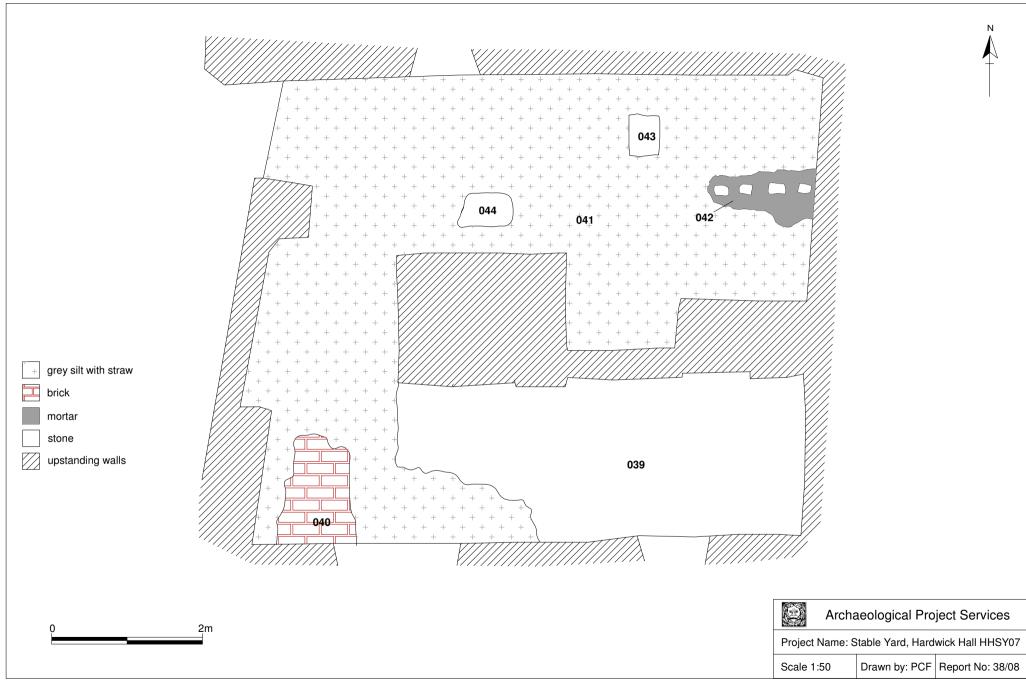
Plan of the Smithy Floor showing different surface treatments
